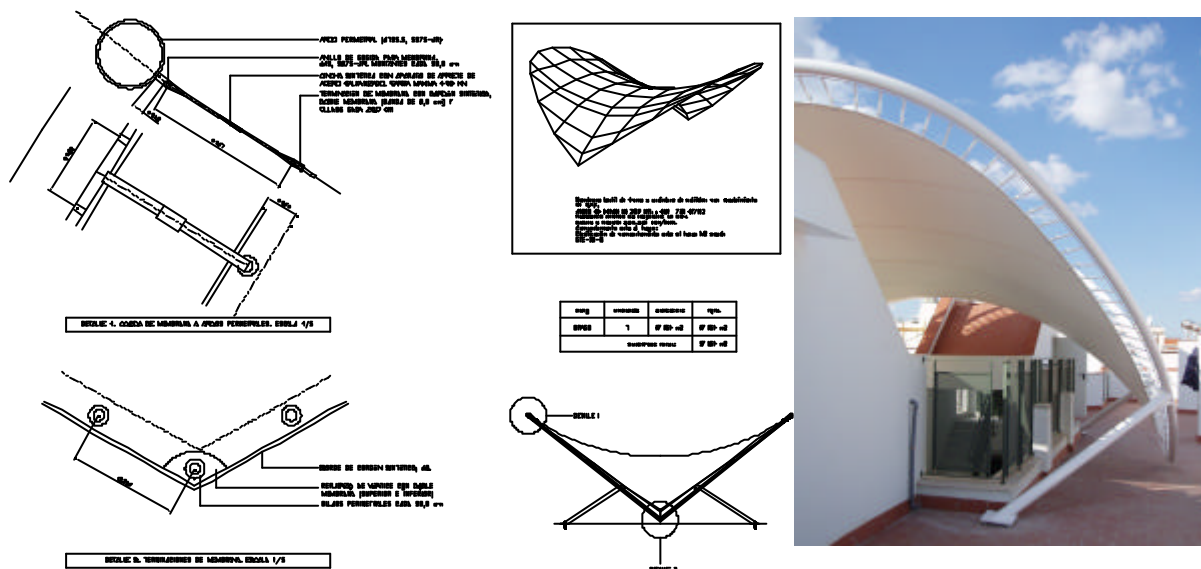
Central yard's roof in a building, Sevilla (J.C. Gómez de Cózar, 2006). Autoamble roof, framed and tautened by all its perimeter, as shown in details. It shows oval shape seeing from above. Arches have two centres..
